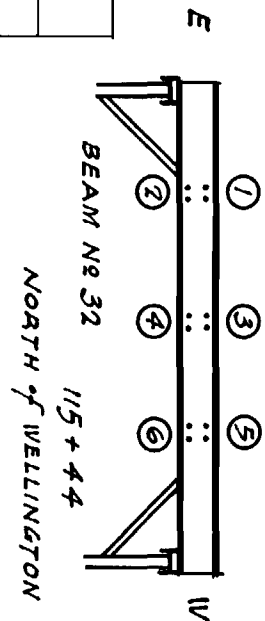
EARTH PRESSURE STRESSES IN DECK BEAM
